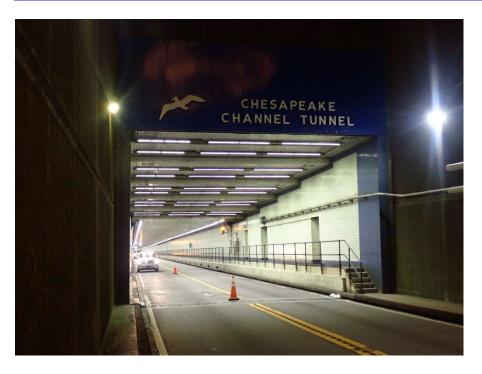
Tunnel Portal – General View of Island 4 Portal (Looking South)
